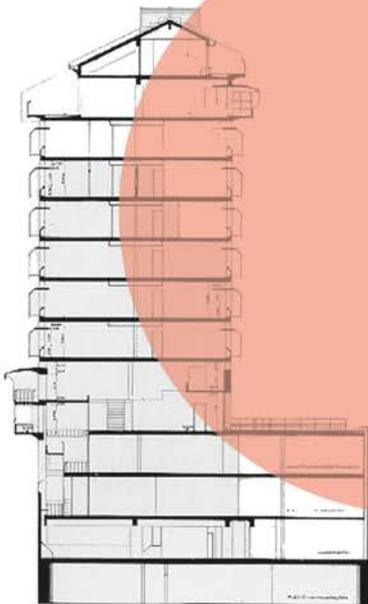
Vertical Section Drawing of "Franjinhas", depicting the building's number of floors and layout
